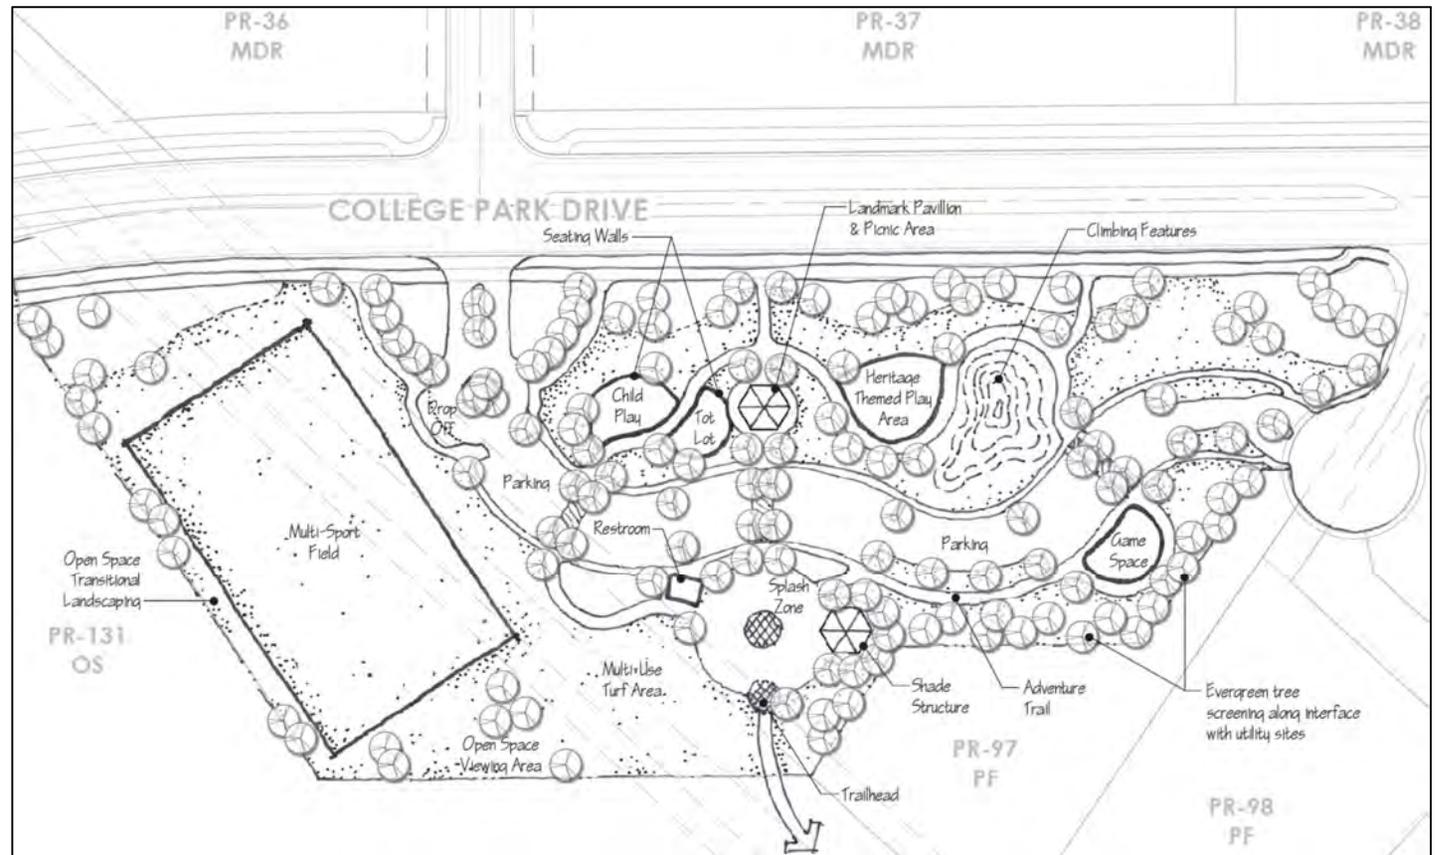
CONCEPT PLAN FOR PARK SITE PR-105
